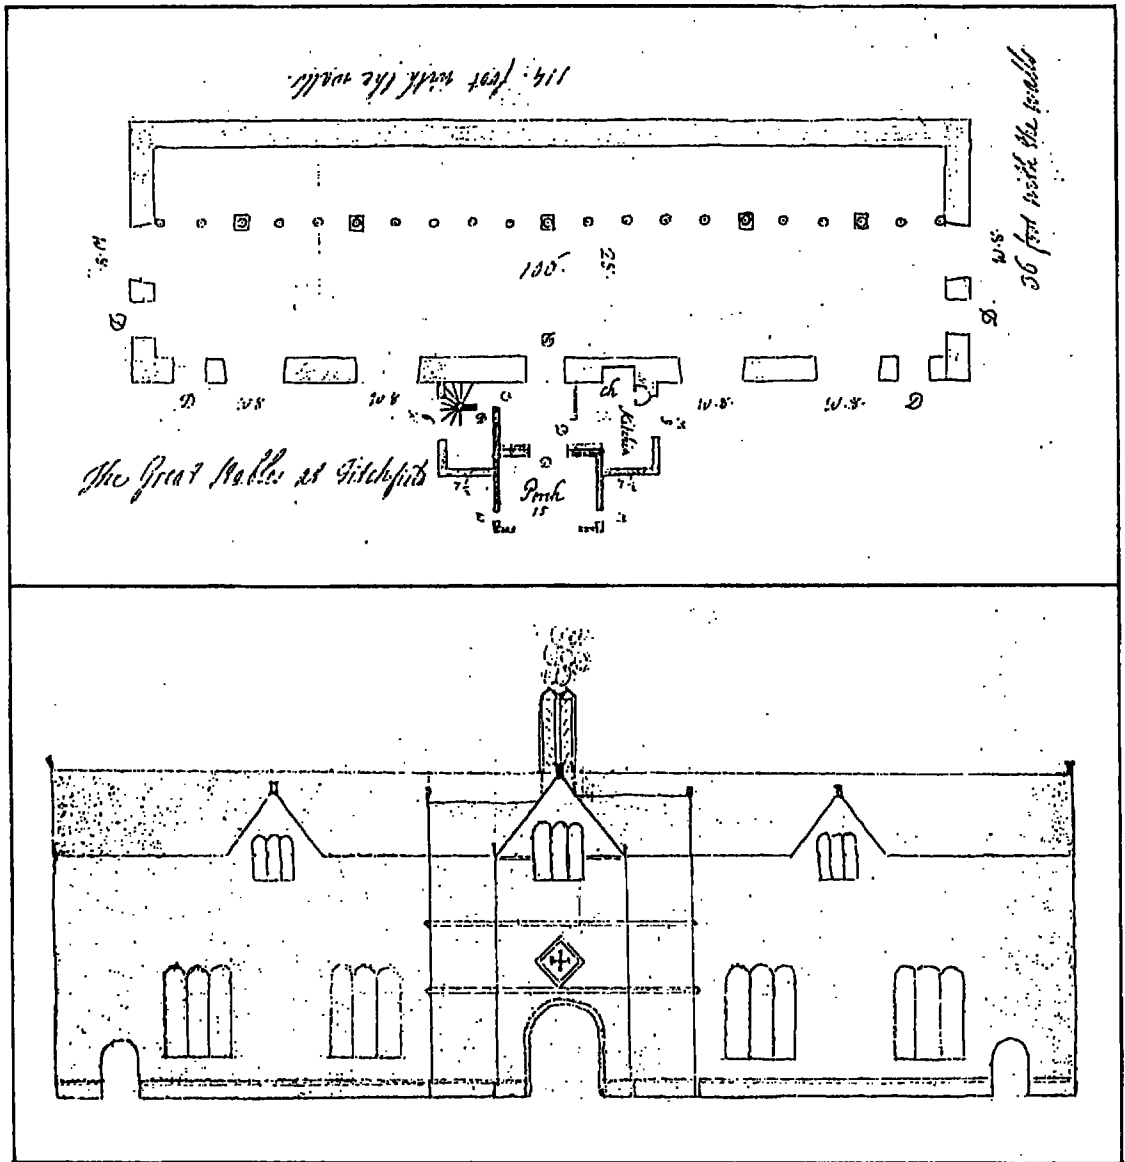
The Great Stables at Titchfield* as drawn in 1737 (HRO 5M53/1558-64). (above) Plan: showing an arcade of columns running the full length of the building. Stall divisions were apparently flimsy or non-existent and are not shown. (below) Front elevation - compare with Fig. 5 - showing a striking resemblance to a gentleman's house.
